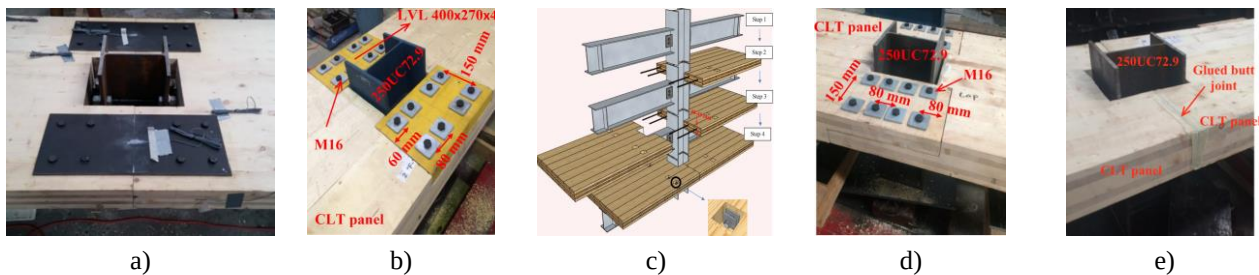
Existing STC beam-to-column slab-to-slab connections; a) steel cover plates (9), b) LVL (laminated veneer lumber) cover panels (10), c) anchored steel rods (11), d) half-lap connection (12), e) glued butt connection (13).
